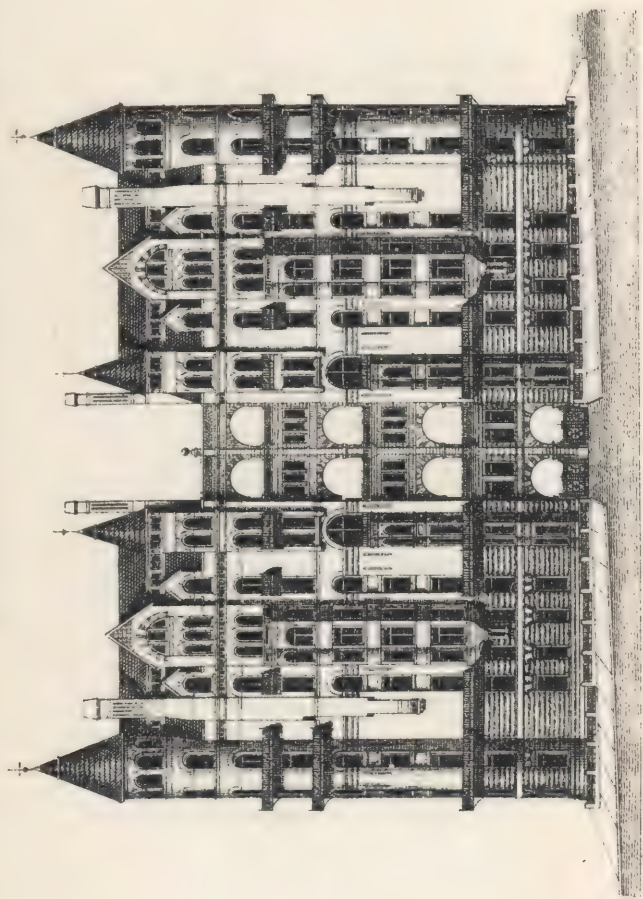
, 7TH AVENUE ELEVATION OF BUILDINGS.
